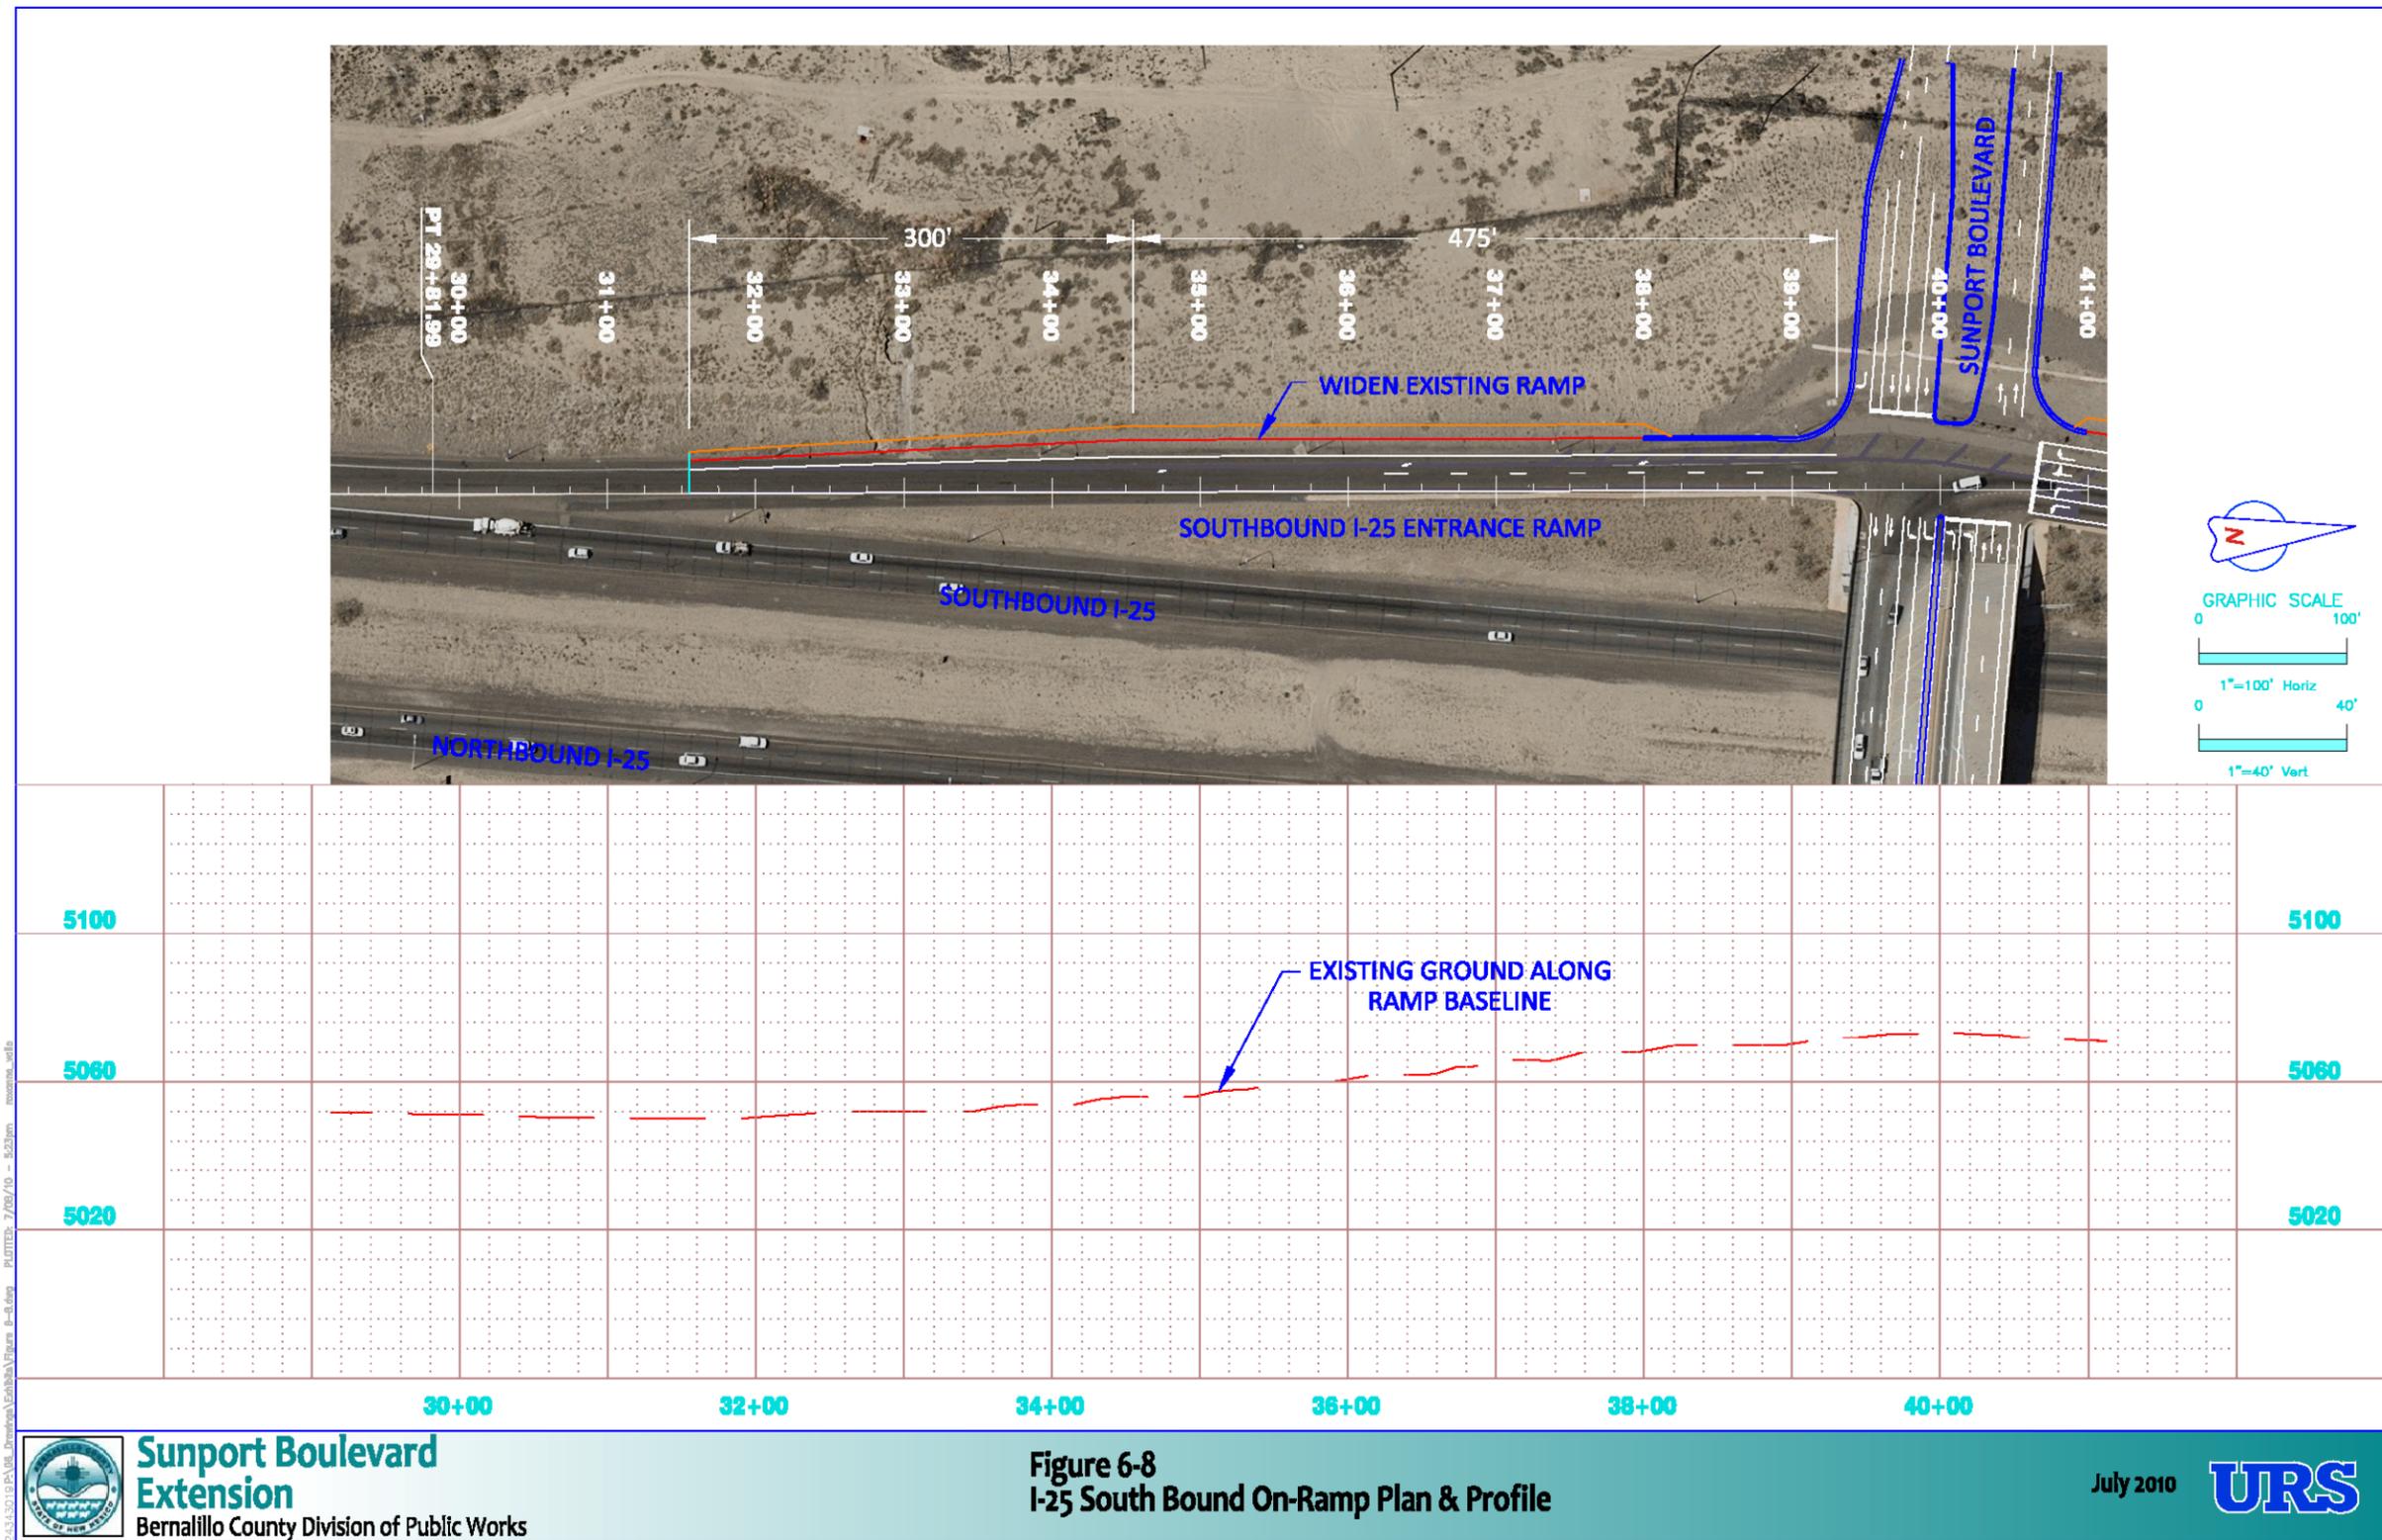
following depicts widening of the southbound off-ramp; Figure 6-8 following depicts widening of the southbound on-ramp. Both ramps are proposed to be widened as an extension of the existing width, on the same profile grade as currently exists. Therefore the existing profile grades control the widening of the roadway section, as depicted in Figures 6-7 and 6-8.
